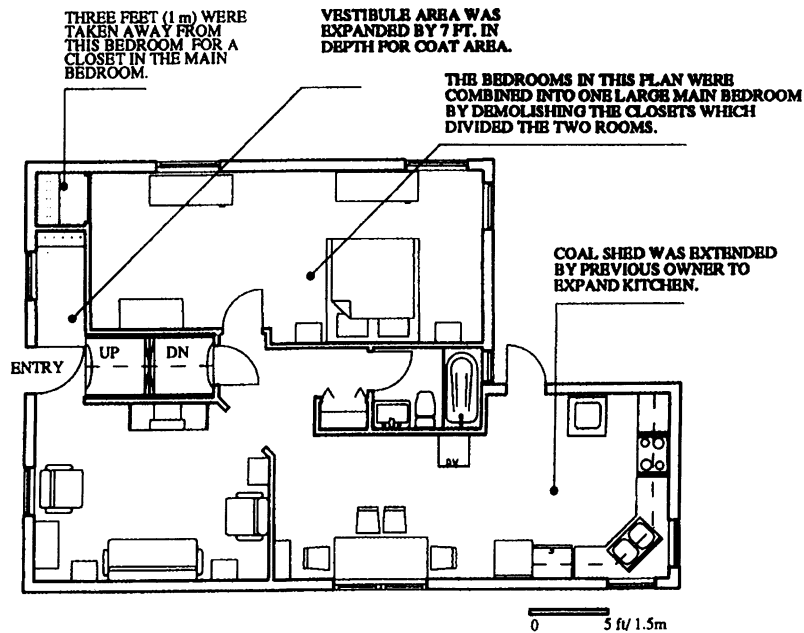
Ground-floor plan of case study 8: expanded master bedroom (vestibule with window).
